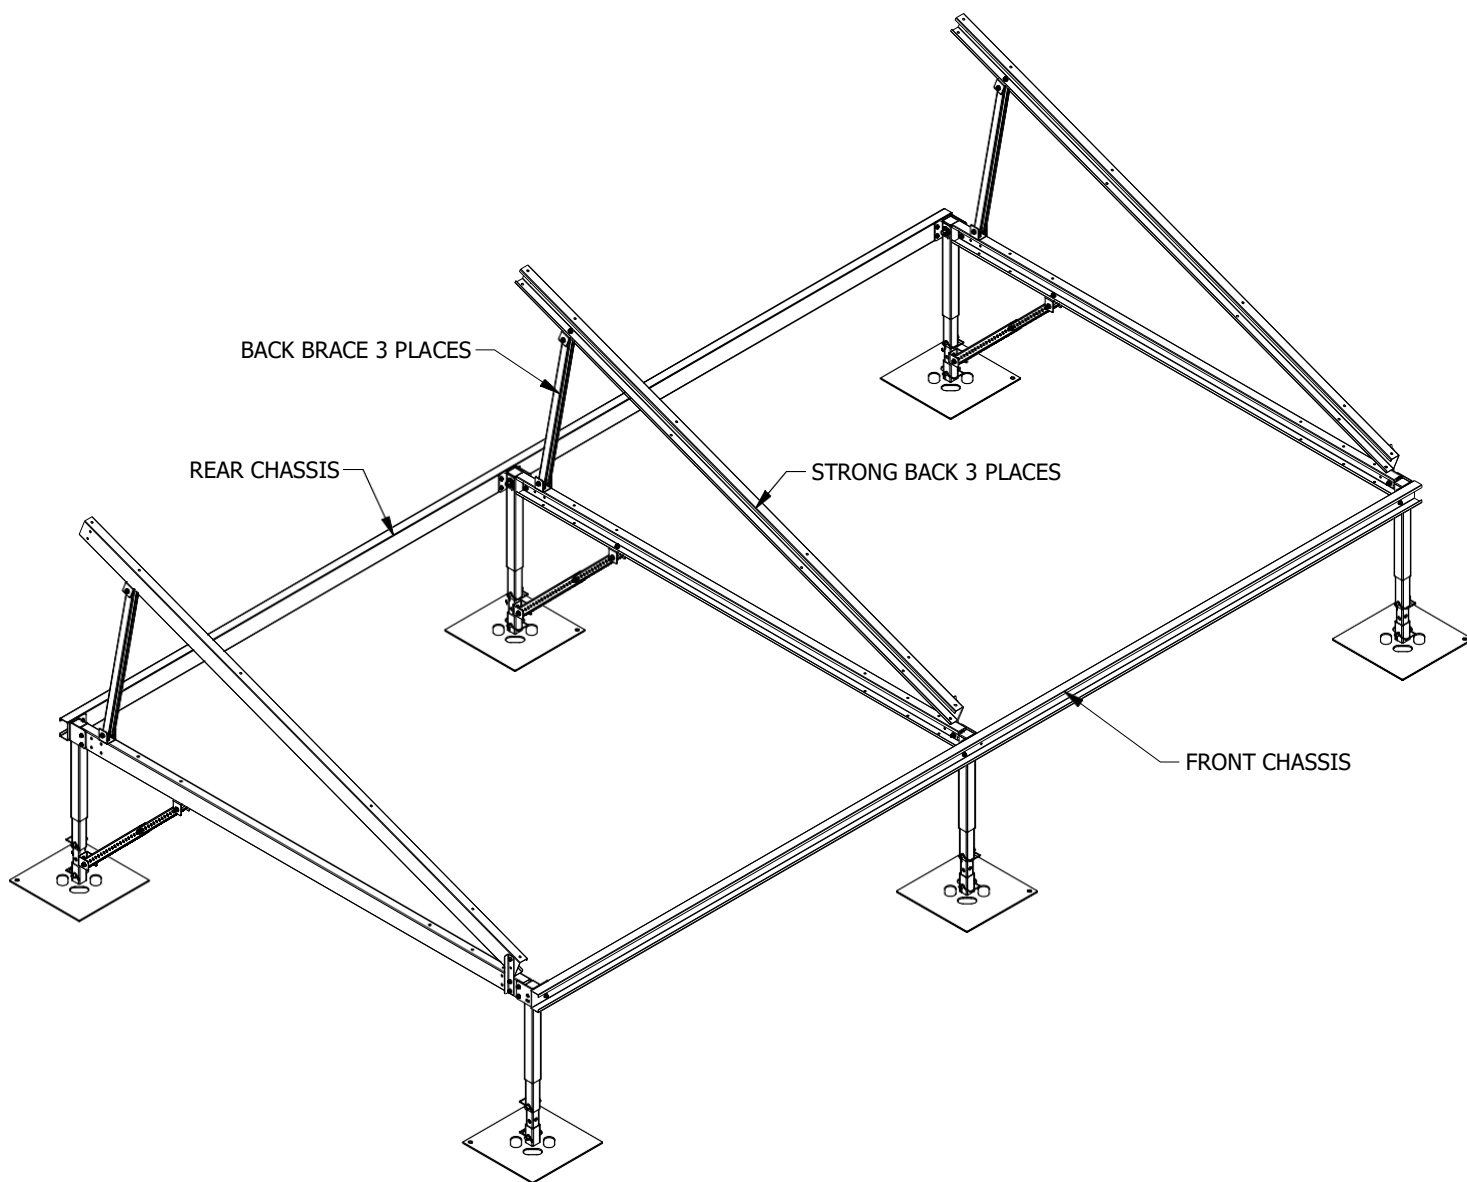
Strong Backs and Back Braces [STD Version shown above]
